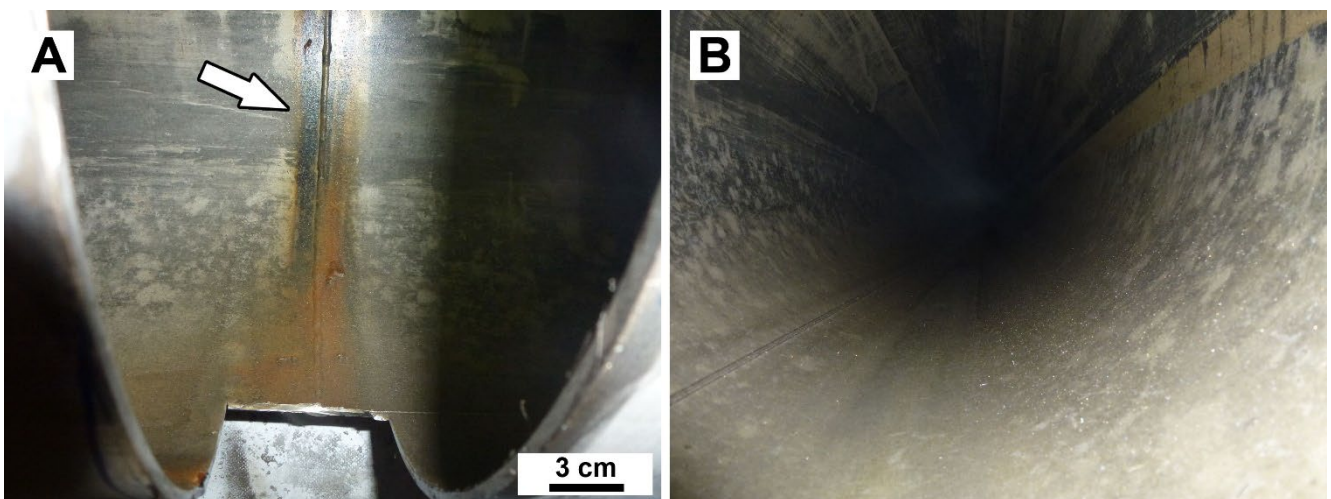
A photo taken inside the pipeline at the specimen collection site.
